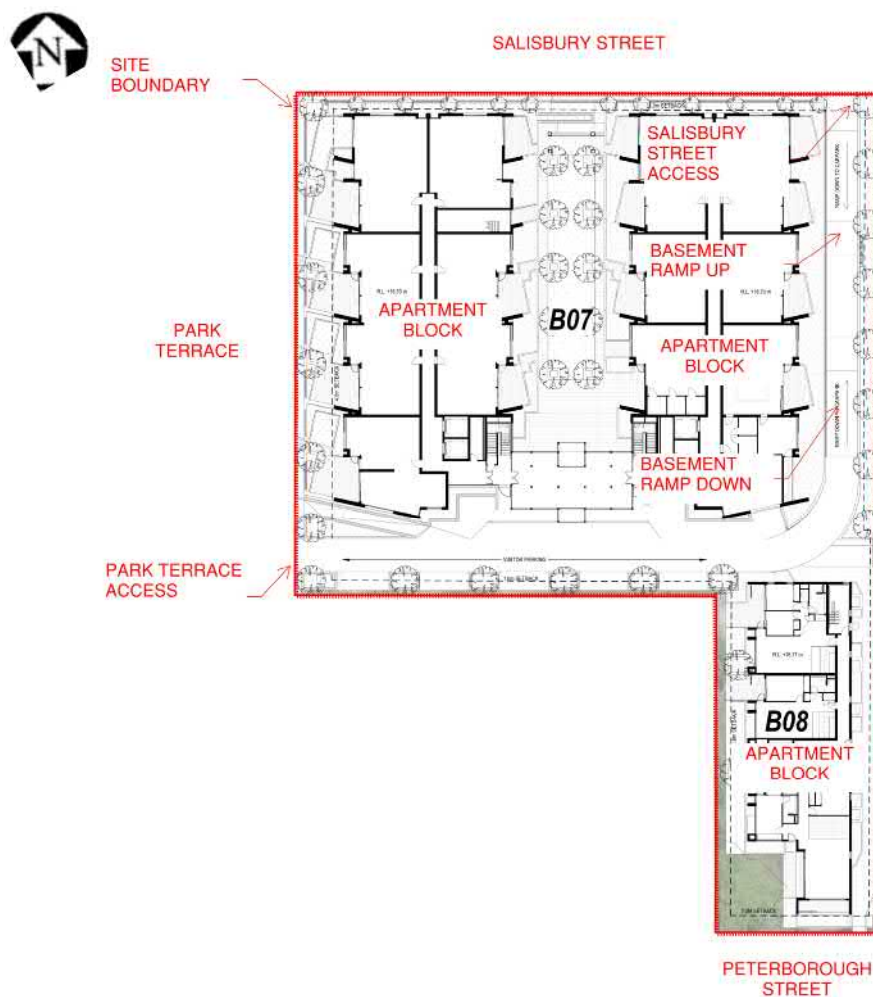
Site 2 Peterborough Street Proposed Site Layout
